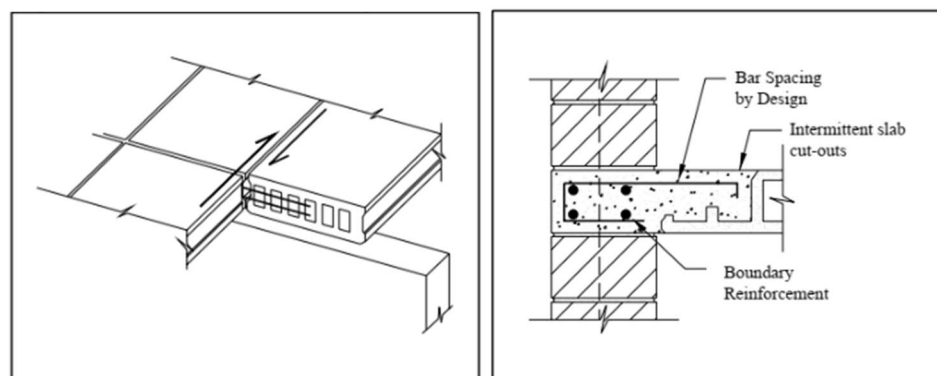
Joint reinforcement (left); Collector detail (right); (Buettner & Becker, 1998, p. 4/7)
